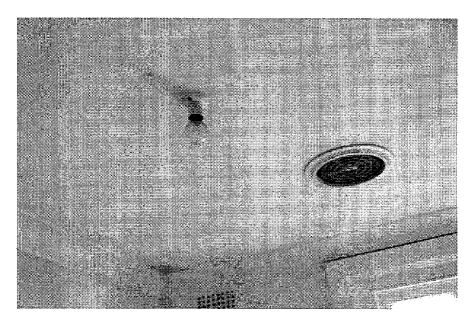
Asbestos cement sheeting located on the ceiling of the toilet of the residential tenancy at 16 Bruce Street.
